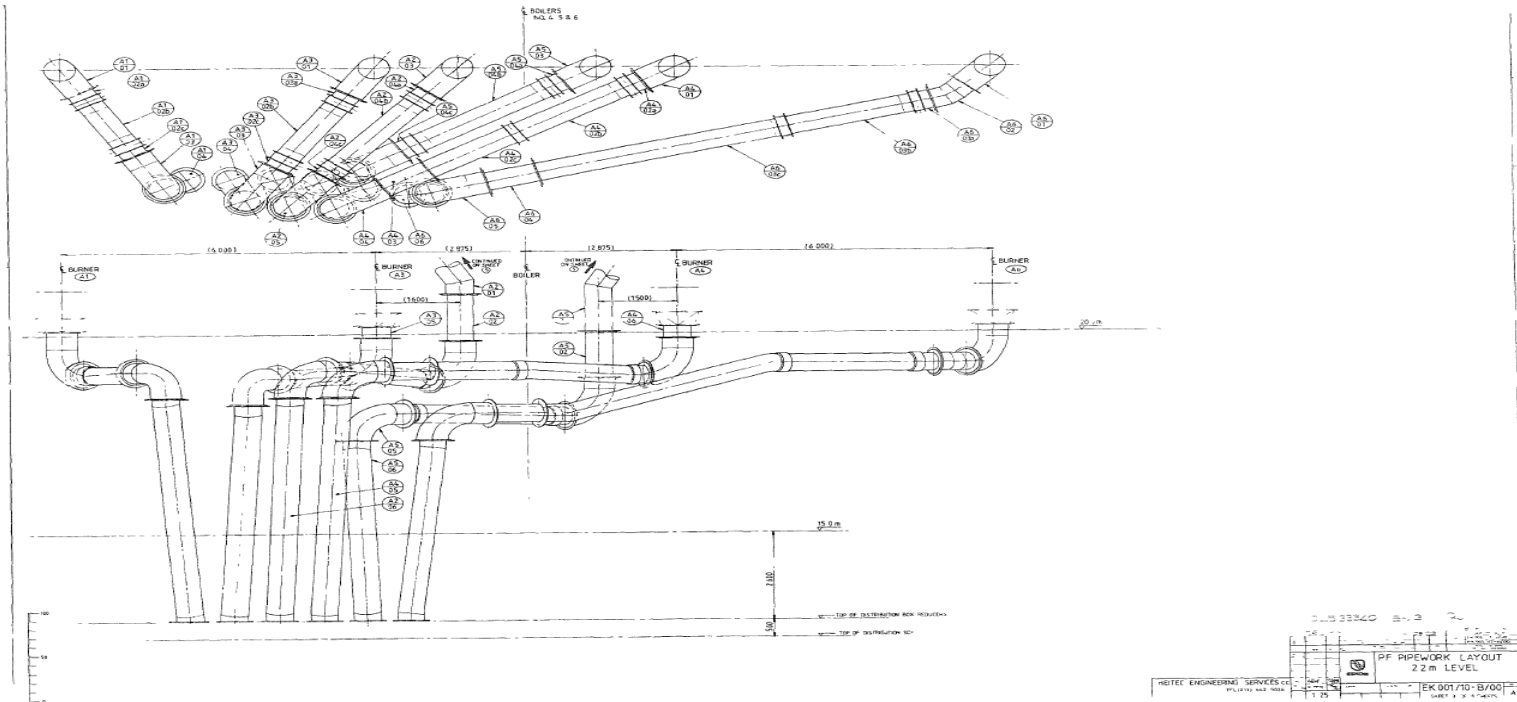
Unit 4-6 Mill A PF pipes arrangements and elevation around the boiler
